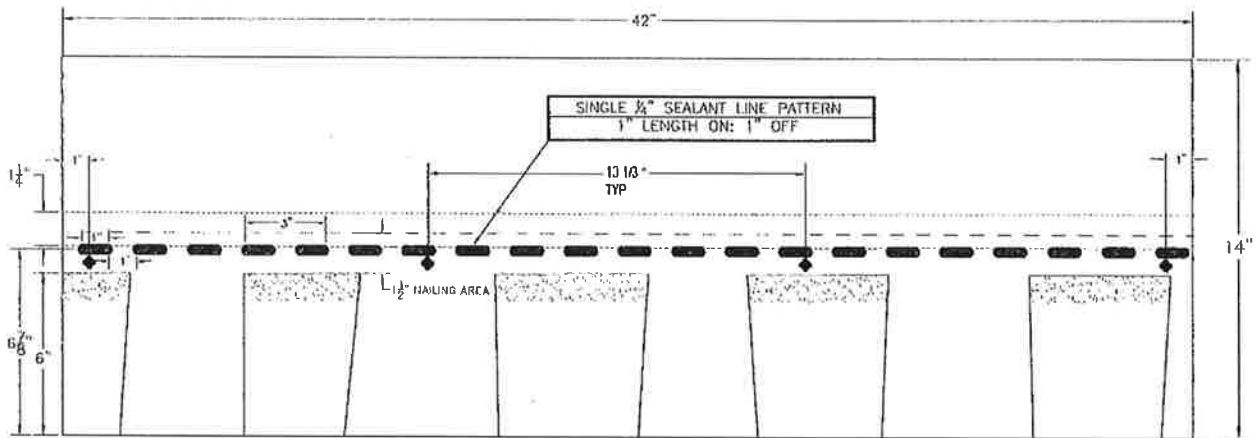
ProLAM™ Architectural Shingle 4 Nail Pattern (non-HVHZ only)
